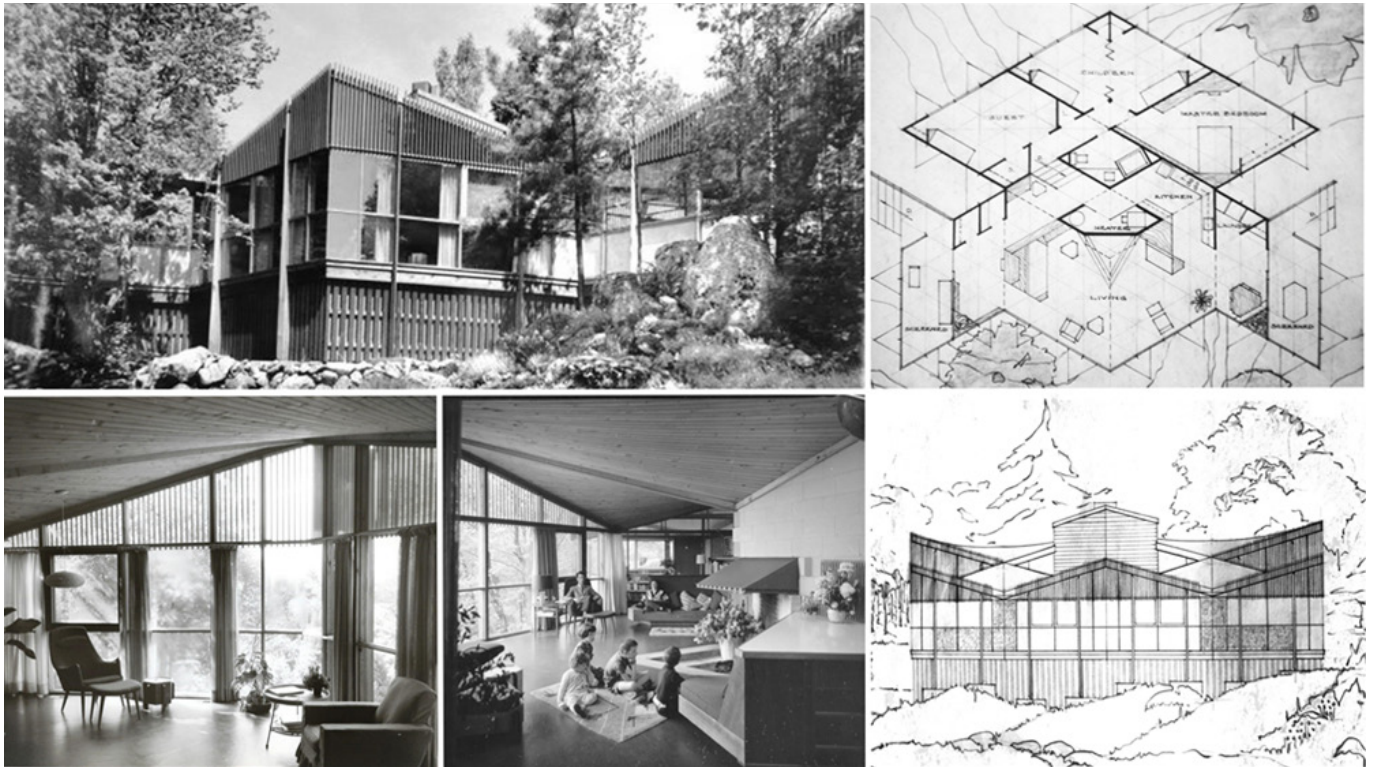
The original design of the Strutt House. Source: Fondation Strutt Foundation. Image processing by authors.
